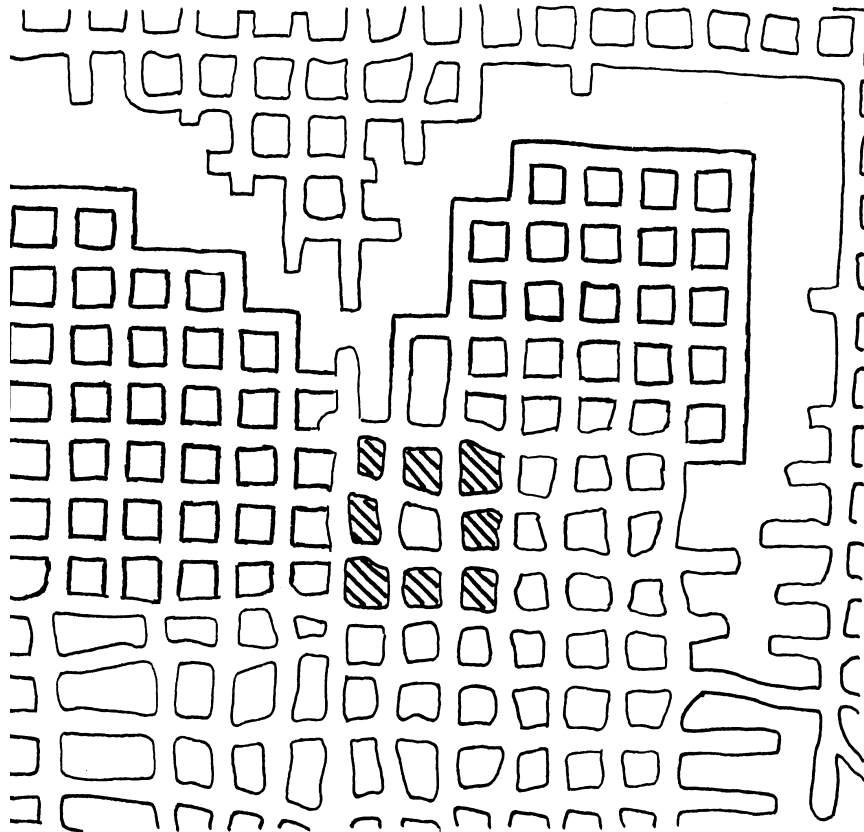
General layout of the area showing the eight pillars surrounding the test pillar.
